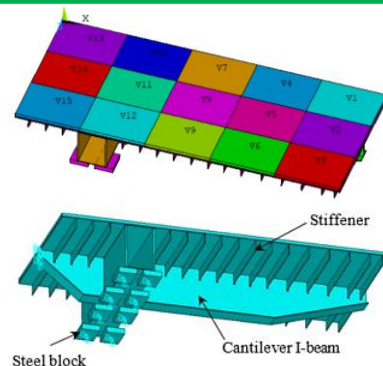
One damaged element/15 elements in a concrete-steel composite structure
